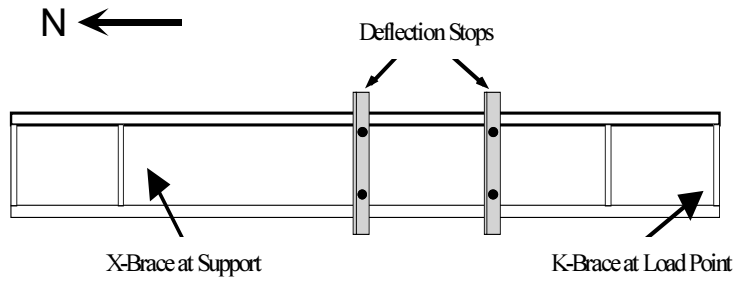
Location of Deflection Stops (Plan View of Girder)
